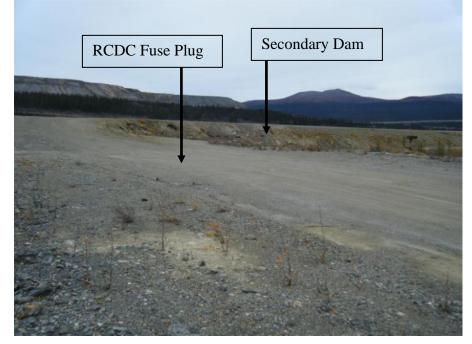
Rose Creek Diversion Channel Fuse Plug, looking towards Secondary Dam (September 21, 2011)
